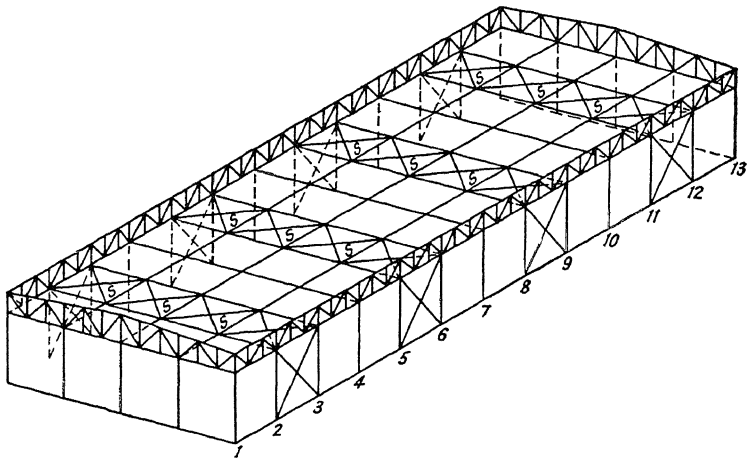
Alternate Bottom Chord Bracing Plan for Buildings without Knee Braces.
